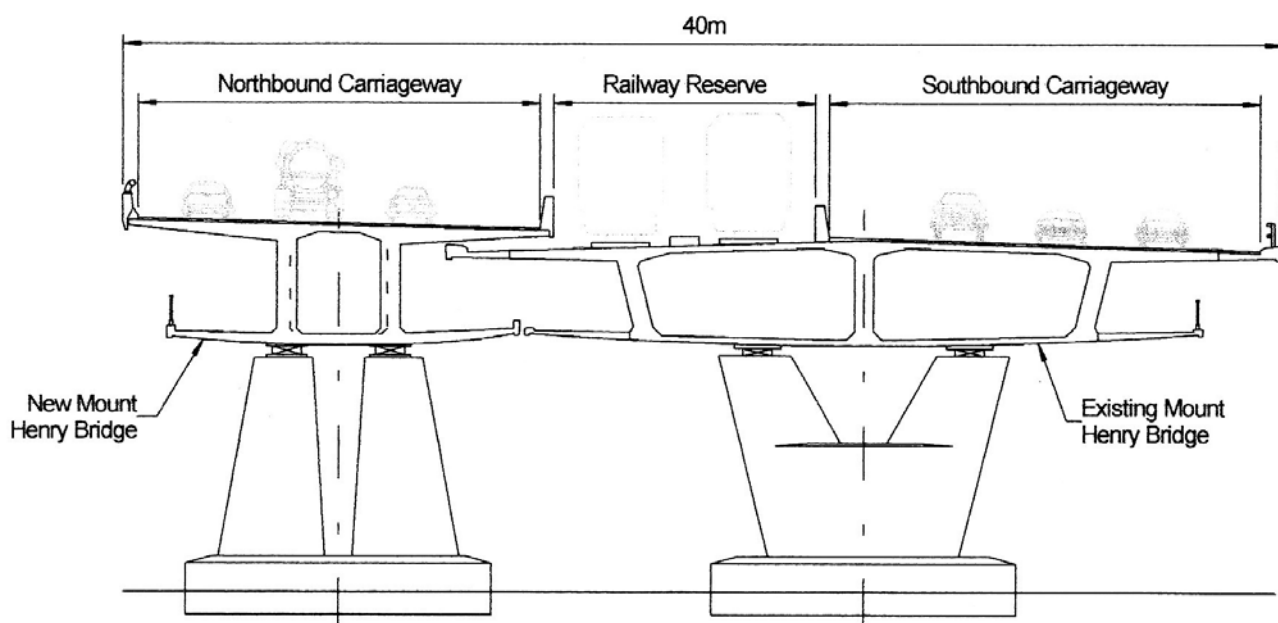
Cross section through original and duplicated Mt Henry Bridges
